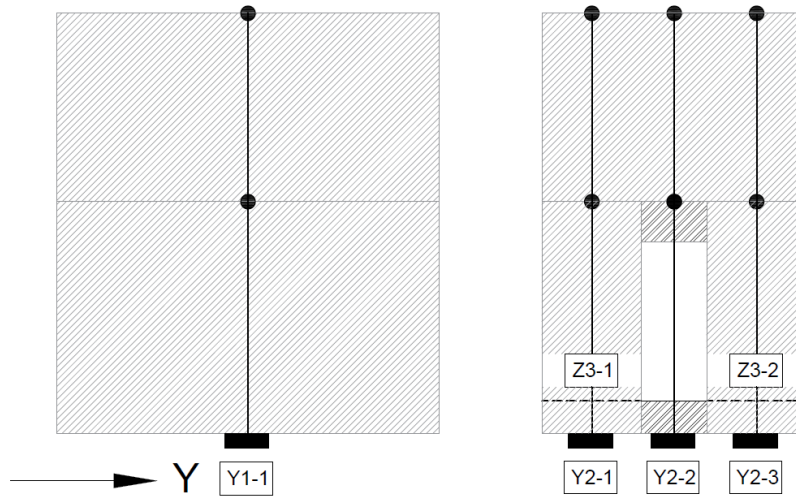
Piers arrangement for house PL along Y axis: exterior wall (left); interior wall (right)
